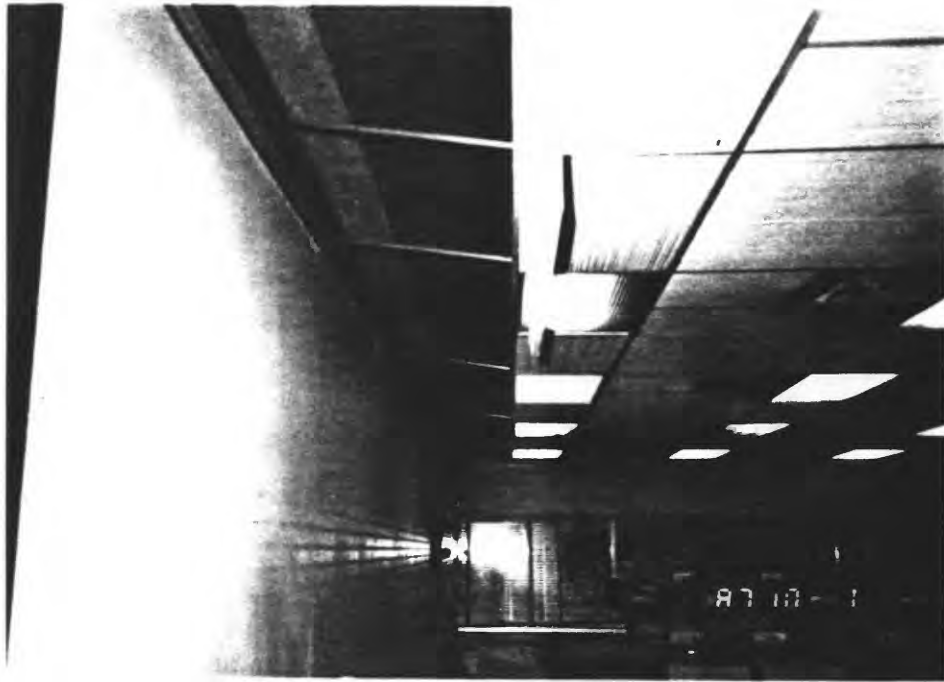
Hanging ceilings in most of the classrooms of the Salazar Building were severely damaged.
